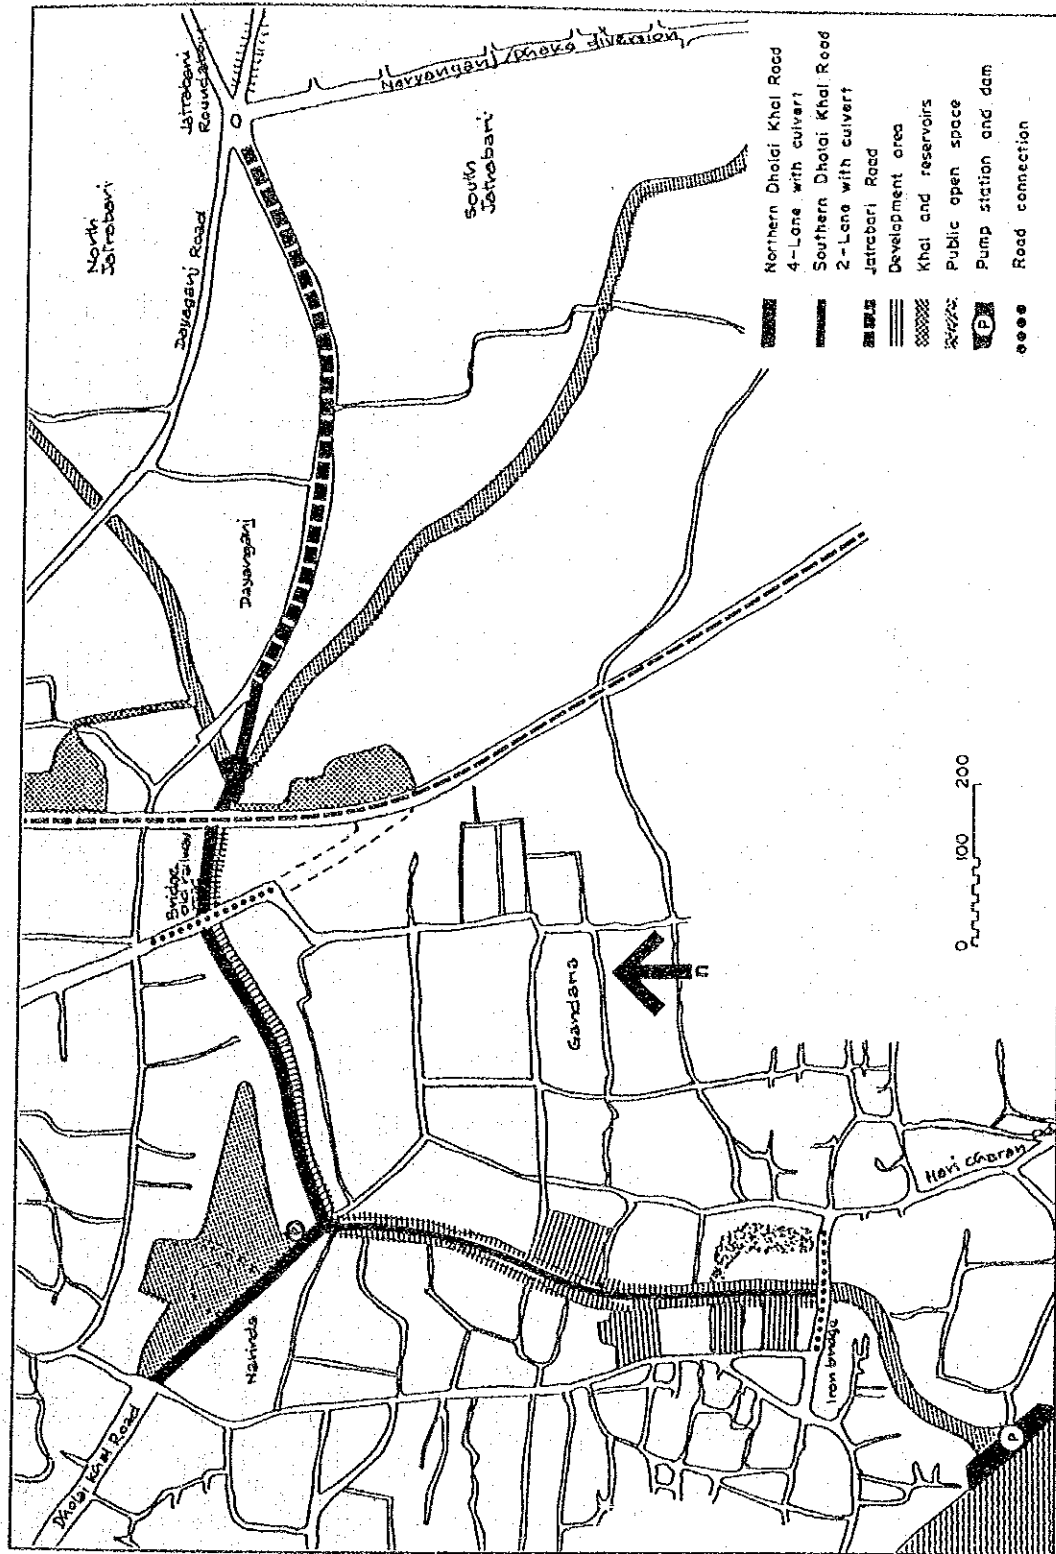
PROPOSED DRAINAGE PLAN OF THE WORLD BANK PROJECT
